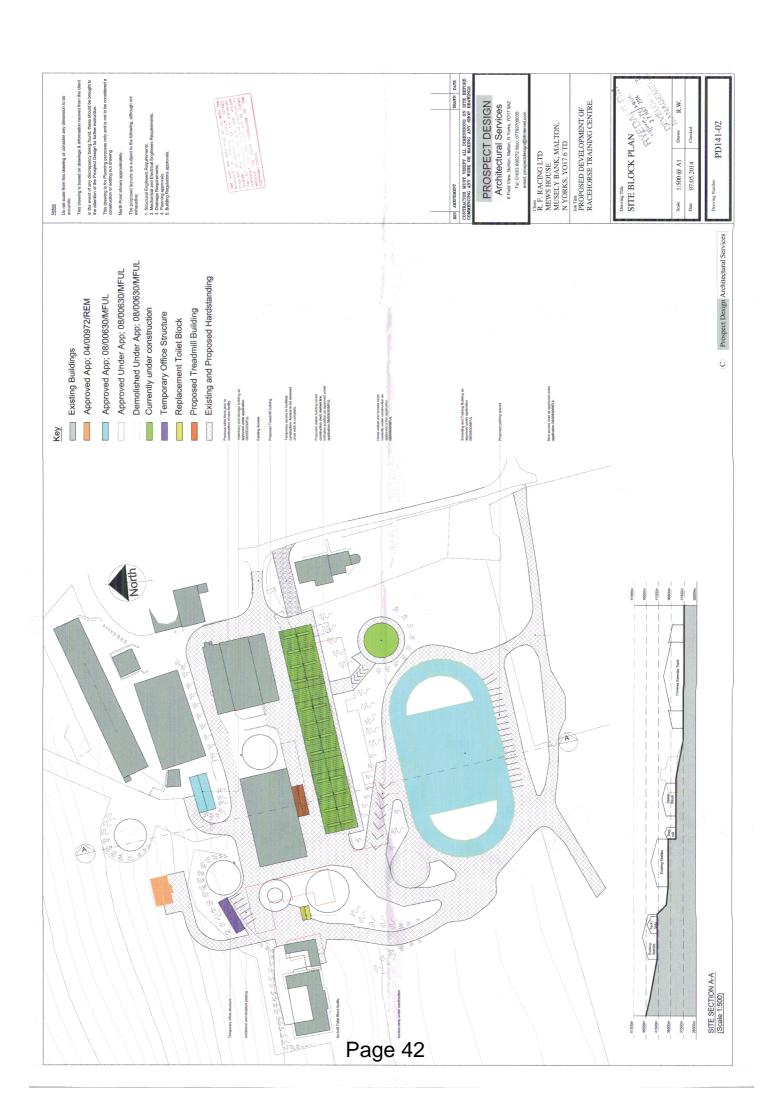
B; Drawing No. PD141-02; Drawing No. PD141-03; Drawing No. PD141-04; and Drawing No. PD141-05
